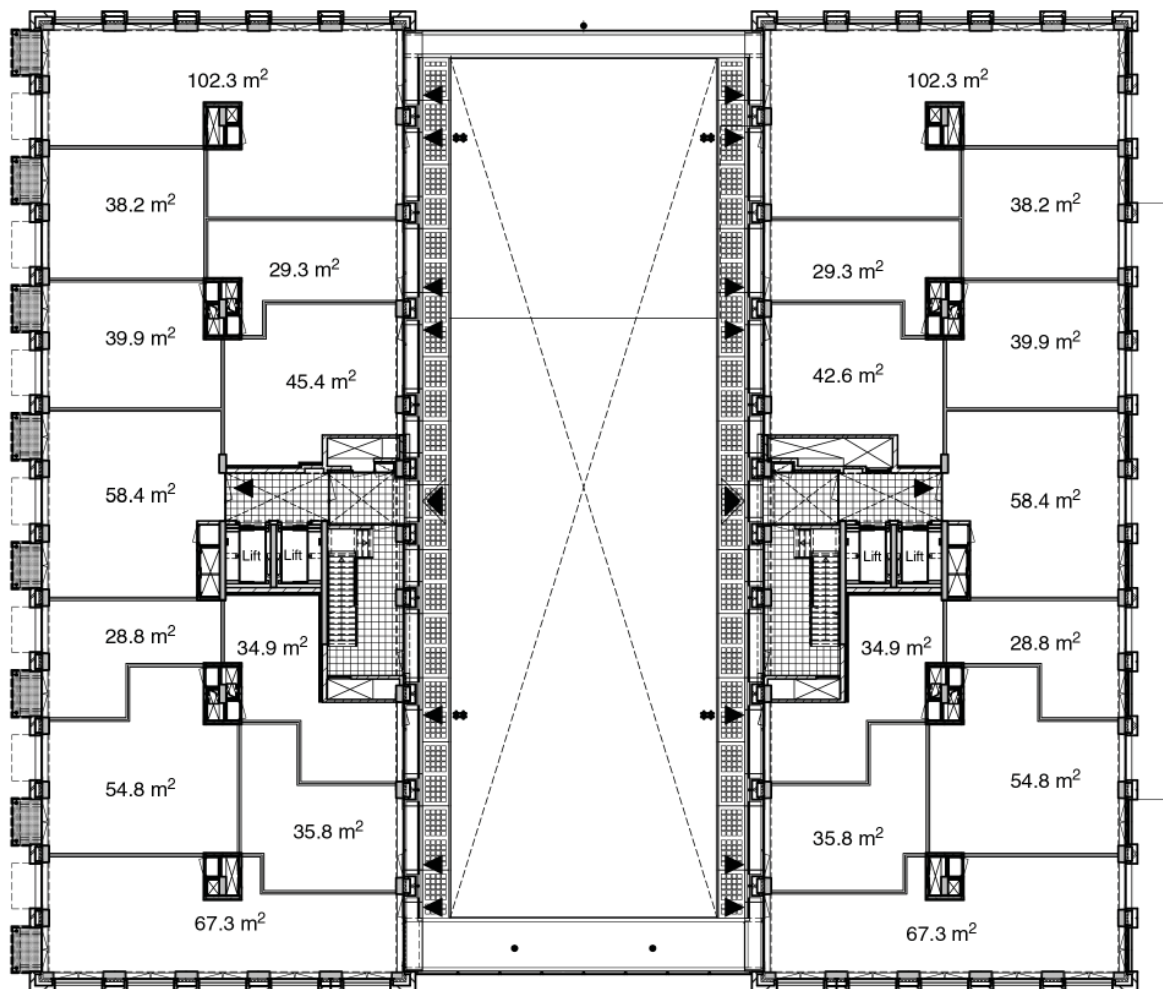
Solid Lv02 proposed allotment plan (Image courtesy of Tony Fretton Architects).
